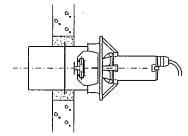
Circulation pump type SR. Installation on wallpipe and with guide rails.
